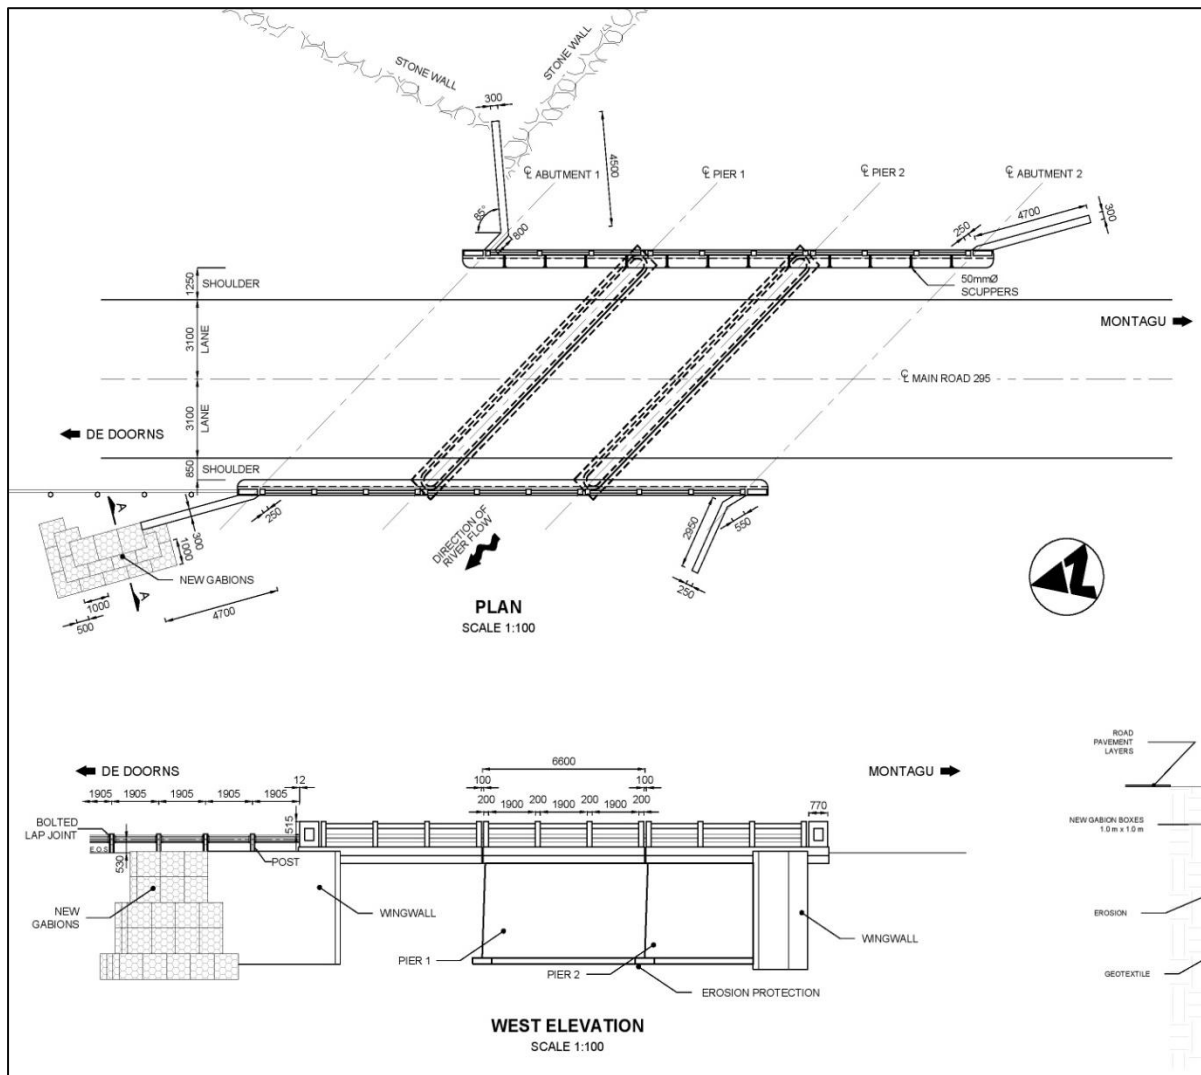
Structure plan for the maintenance work proposed on the Koo River Bridge 3064 (SNA Engineers, 2021)
